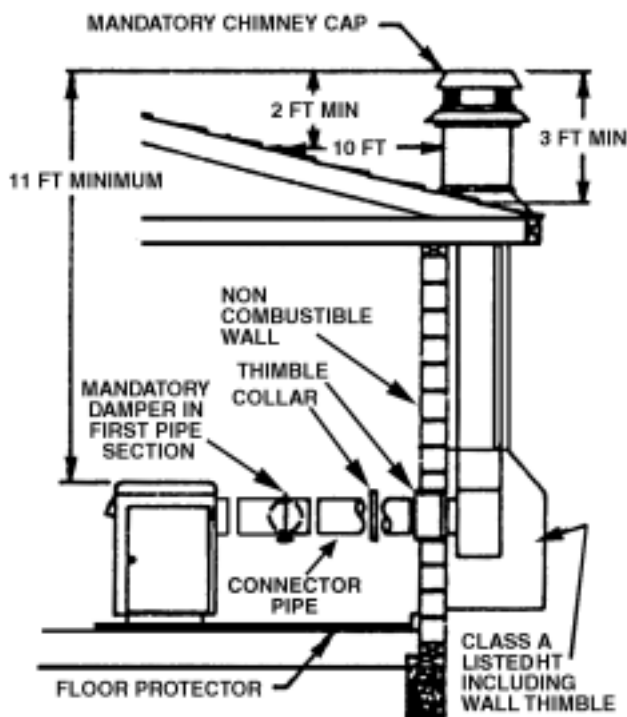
Chimney Connection to Firebox Through Masonry Wall
